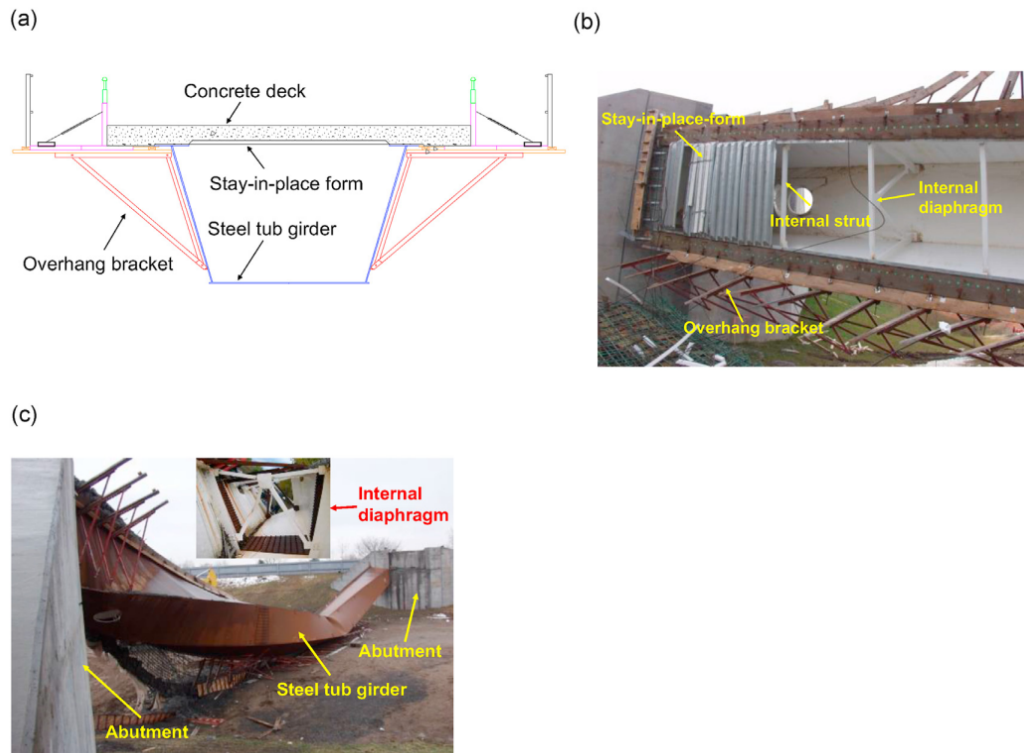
Collapse of Marcy Bridge. (a) Cross section. (b) Post collapse. (c) Collapsed steel tub girder
